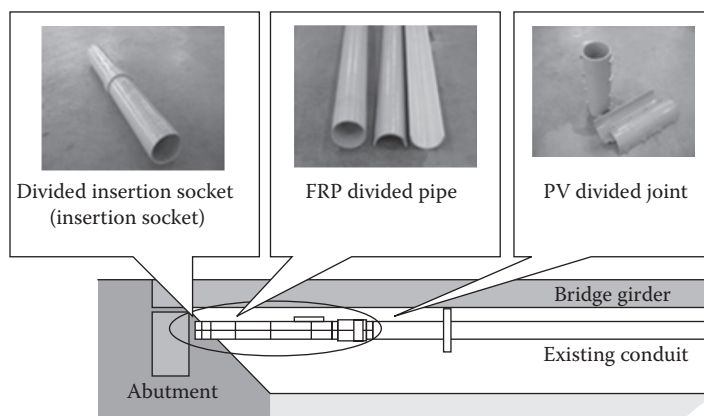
Overview of technology for conduits attached to bridges.
